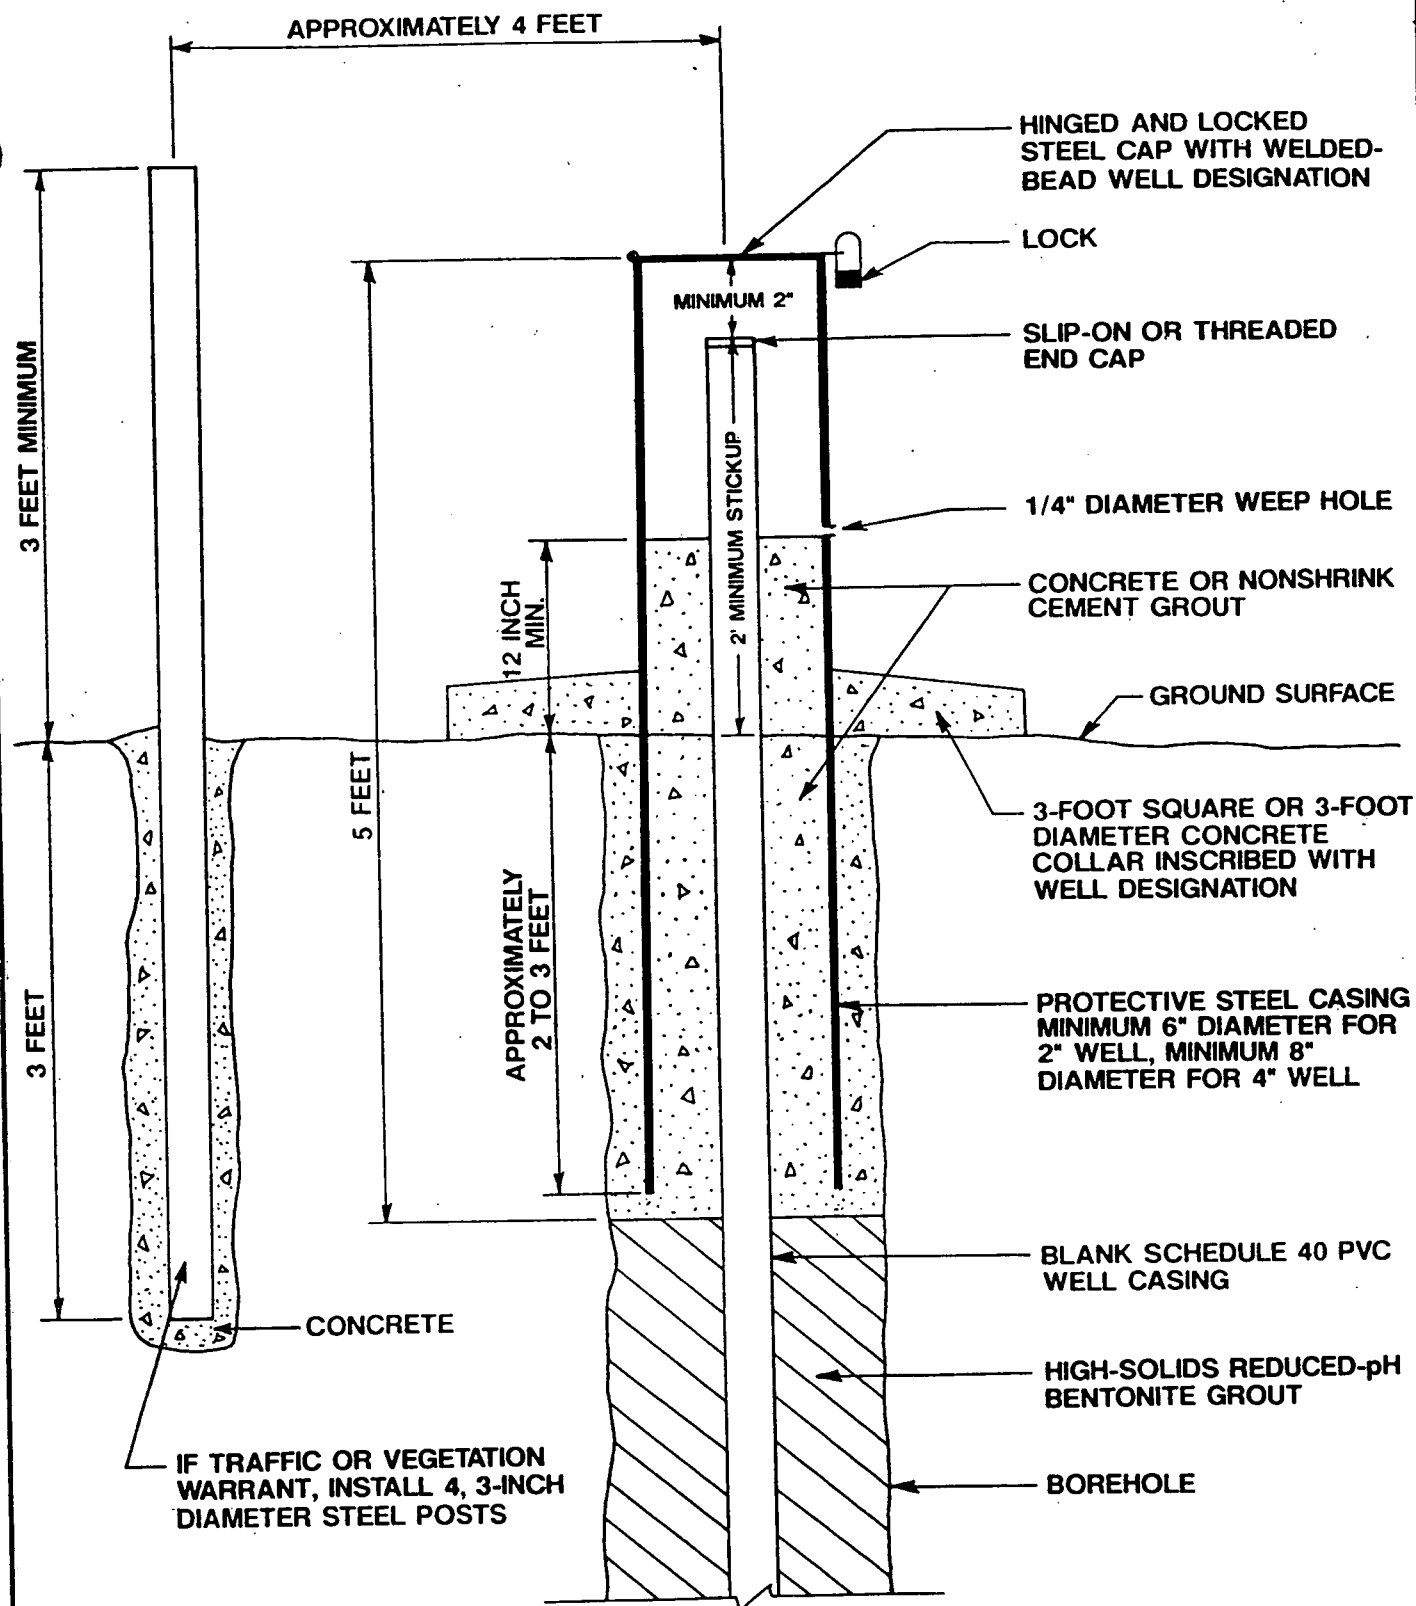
shows a schematic diagram of well features at the ground surface. A 5-foot-long protective steel casing with a hinged and locking steel cap will be installed over the monitoring well riser that projects above the ground surface between 24 and 48 hours after initial grout placement. The protective casing will have a minimum 8-inch I.D. for 4-inch wells and a minimum 6-inch I.D. for 2-inch wells. The well designation will be welded on the protective casing.
